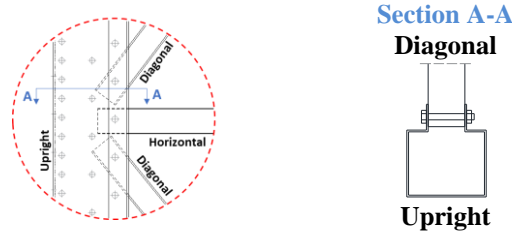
Typical configuration for an ARSWs' diagonal-to-upright connection.
